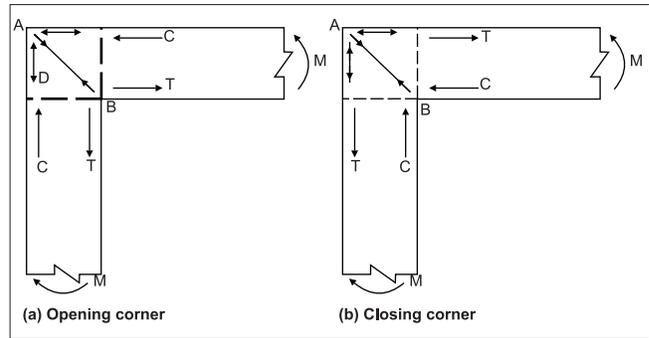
Forces in a two member connection I-joints<sup>8</sup>
